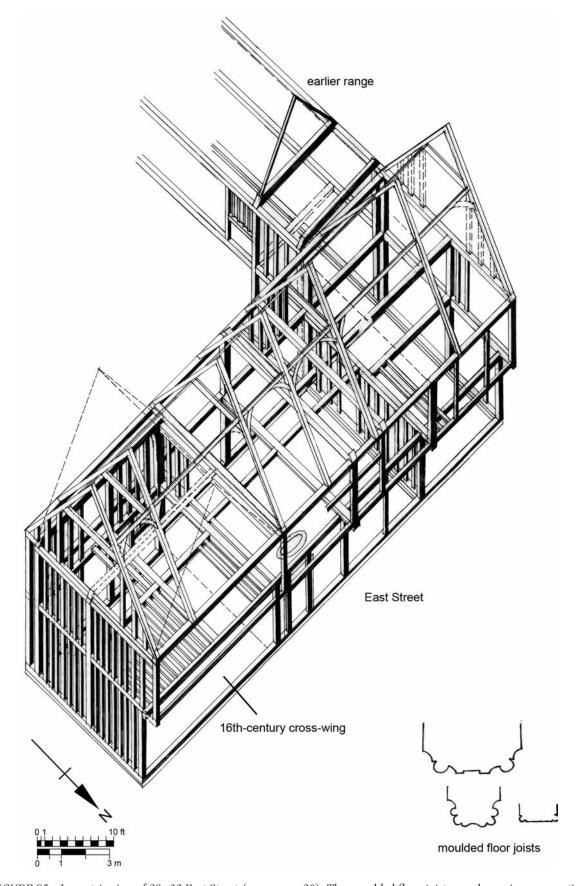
Isometric view of 29–33 East Street (corpus no. 20). The moulded floor joists are shown in cross-section (not to scale)
